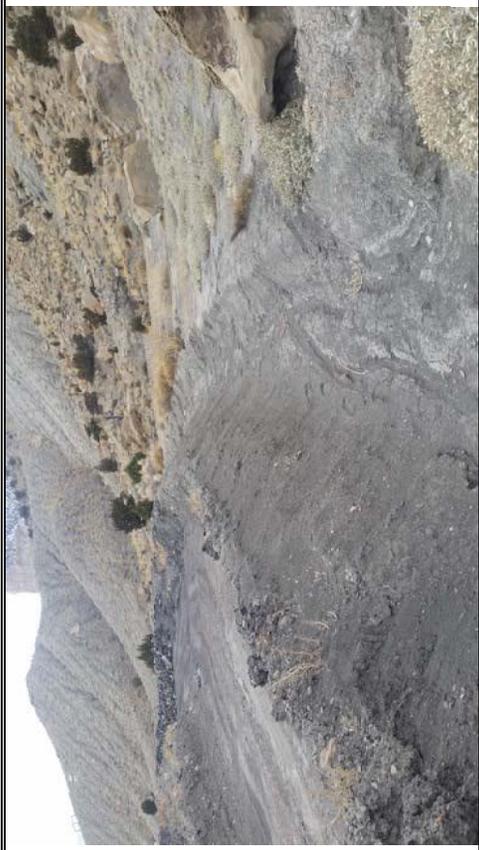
SOUTHWEST DIVERSION DITCH
